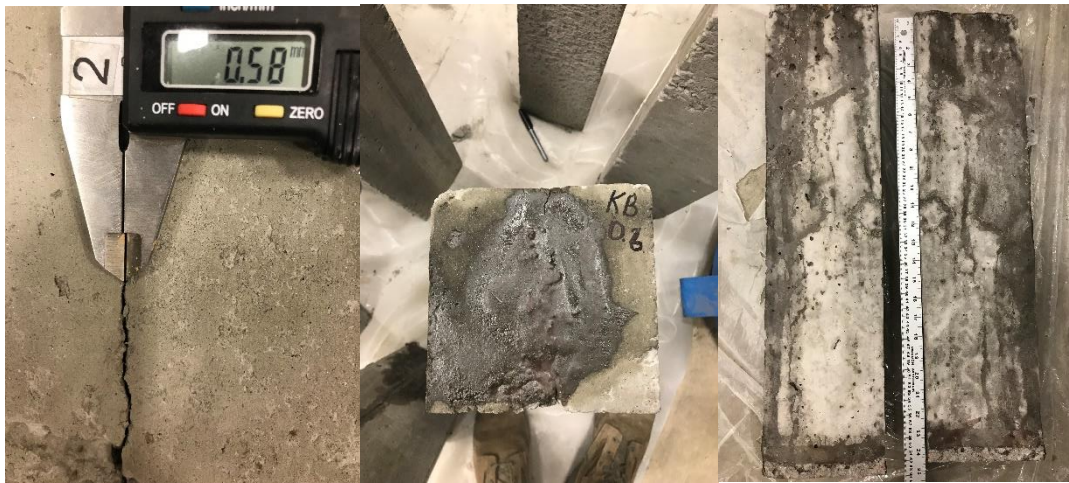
Kwik Bond Beam Specimen at 0.6 mm
